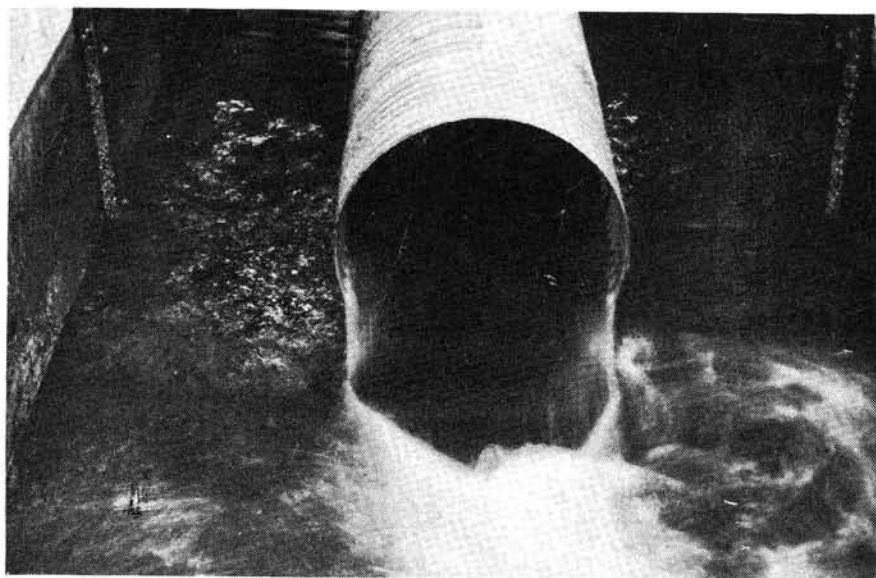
Outlet of 36-in. Diameter Corrugated Culvert
